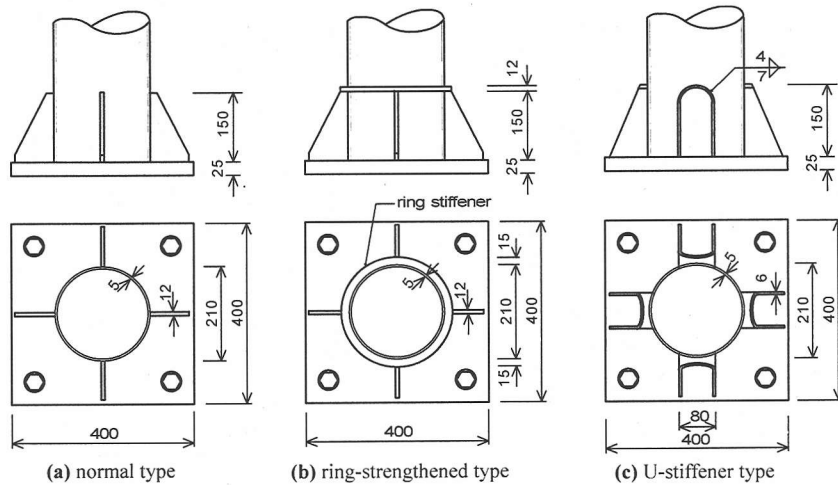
Partial elevations and plan views of post structures (unit in millimeter).
